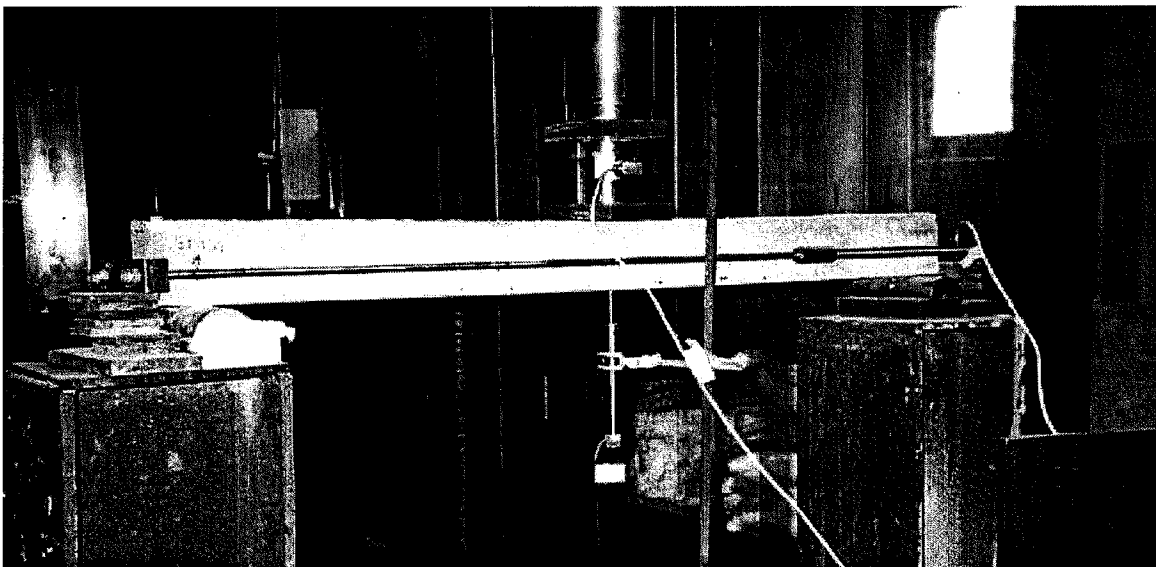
Picture of the Strengthened Reinforced Concrete Element.
